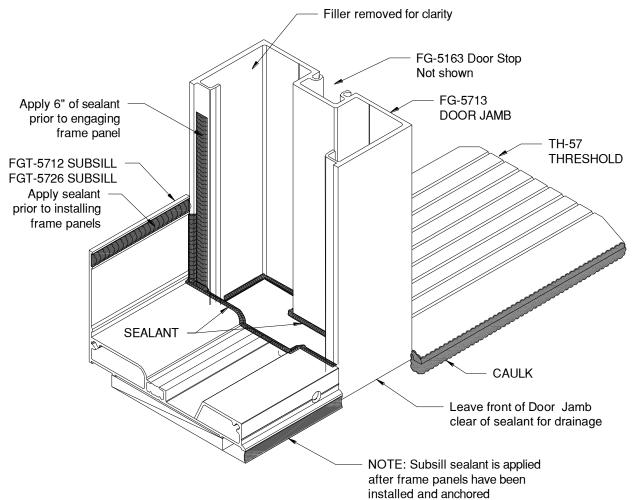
Door Jamb and Subsill Sealant Application at ArmorDefend™ Plus
